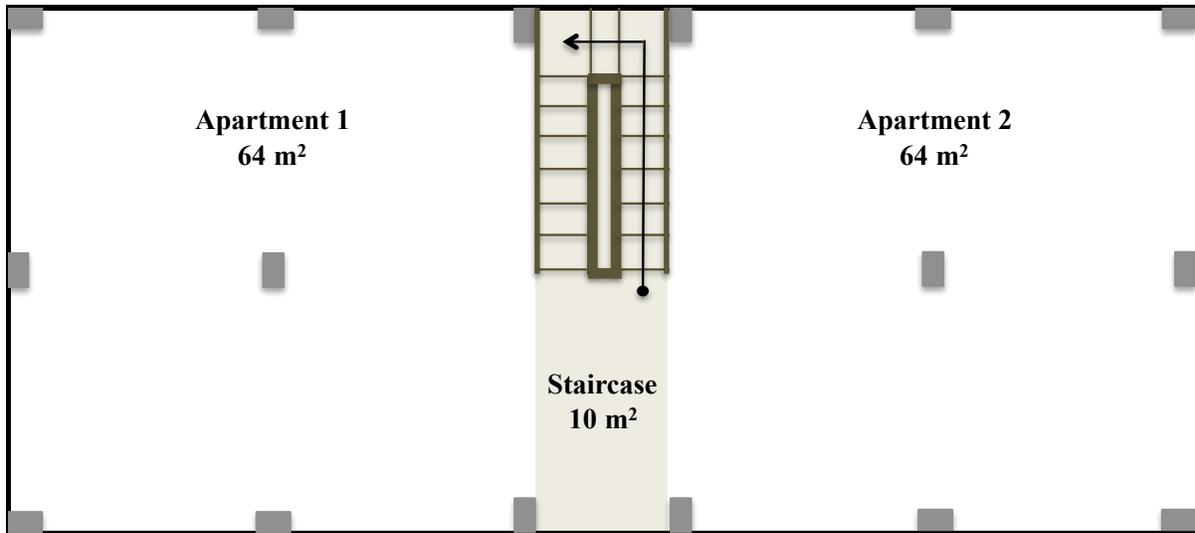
A Schematic of a Typical Middle-Income Residential Floor Plan (138m²) in Egypt
